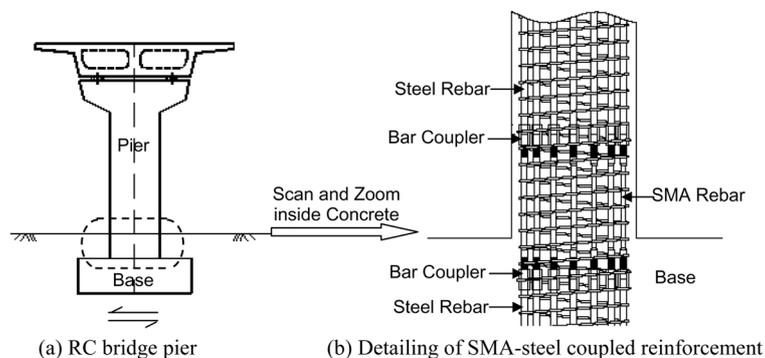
RC bridge pier reinforced with coupled SMA-steel rebar
